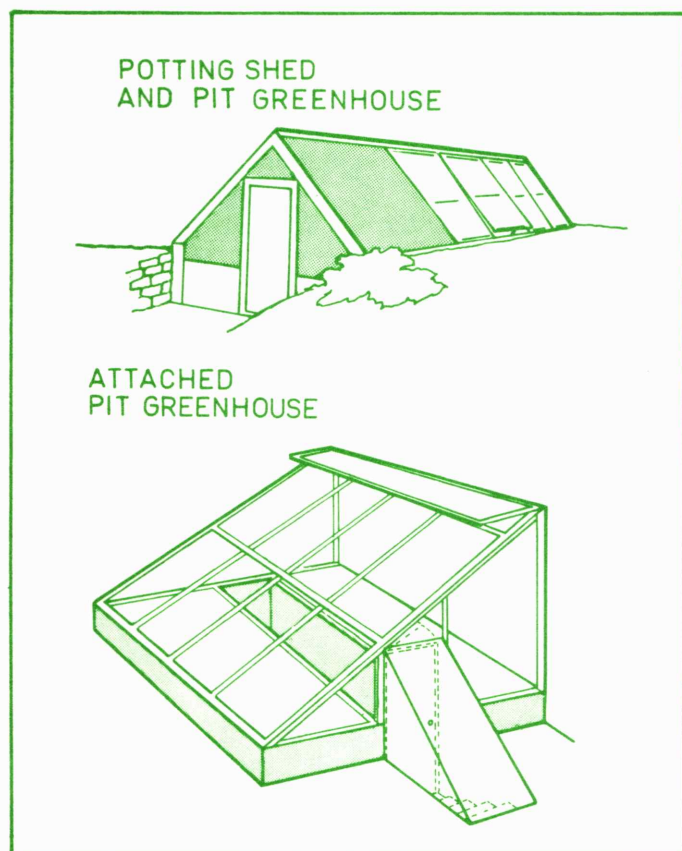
Pit greenhouses. The attached shed serves as storage, a workroom, and shelter for the heating unit.
